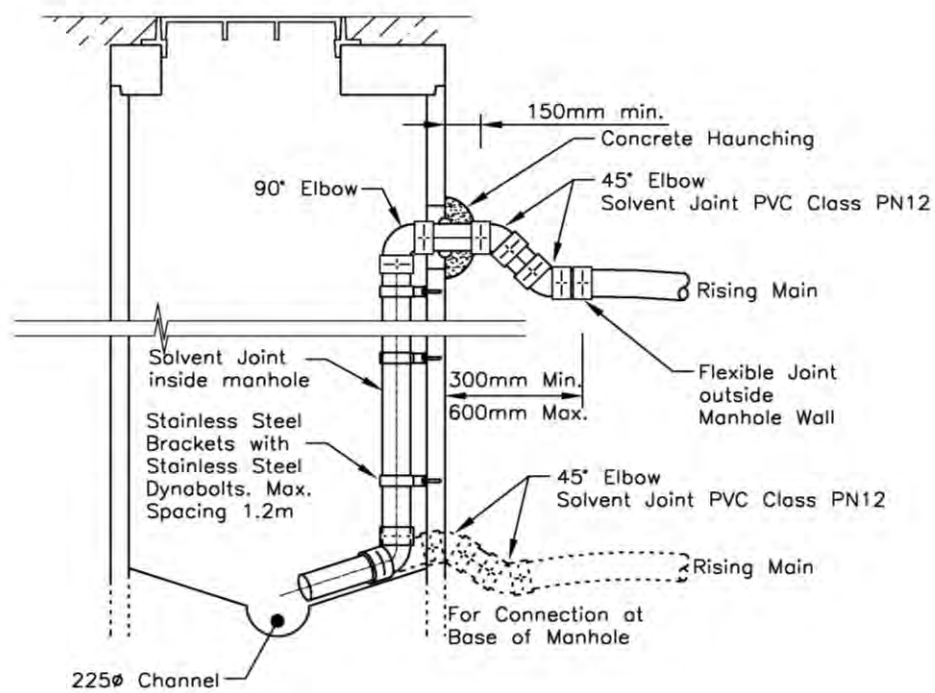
TS 500.4B Receiving manhole detail for connections from wastewater pump station
